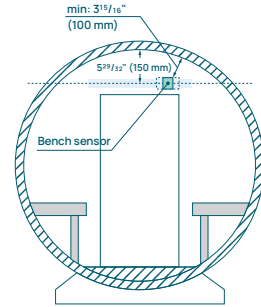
Installing the safety sensor on the ceiling in barrel saunas: floor-mounted heater
